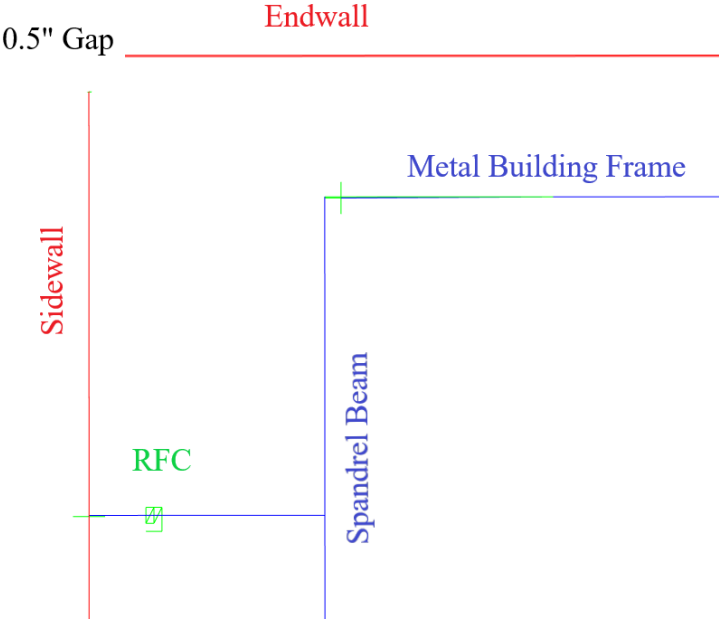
Plan View of Precast Walls structurally separated at Corner of Building
